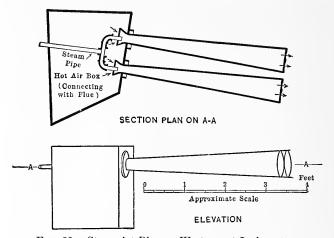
Steam-jet Blower, Westmount Incinerator.
